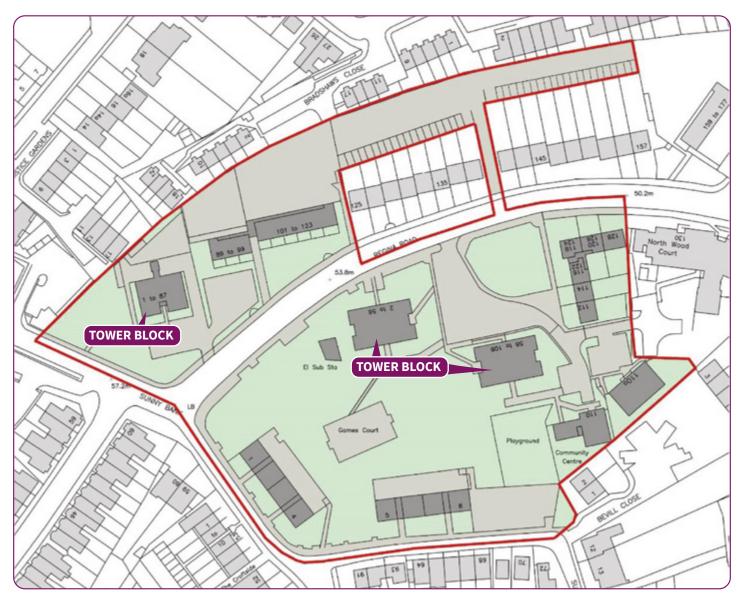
Plan No.1 – Showing location of three tower blocks and surrounding medium and low rise development within a boundary
